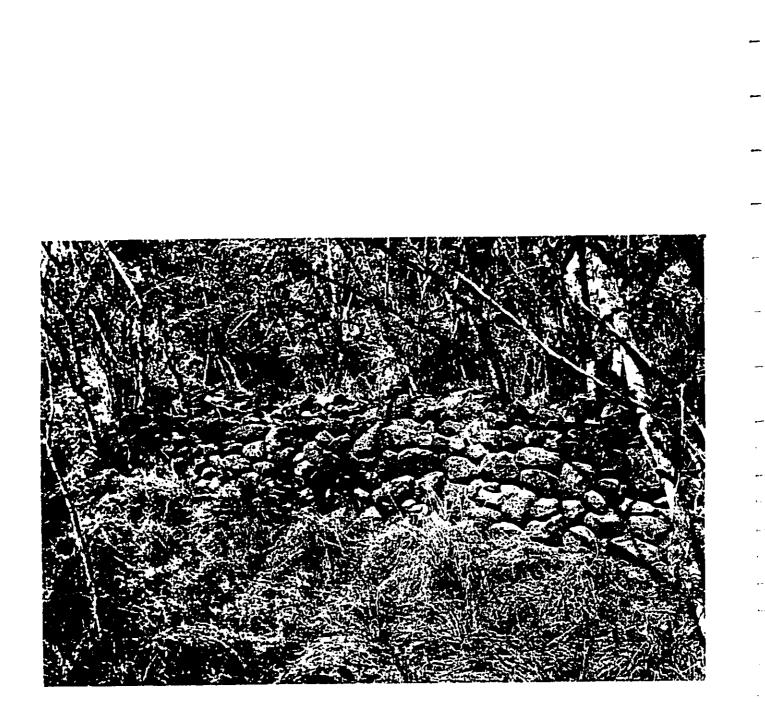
Dry masonry stonework lining irrigation ditch near Reservoir 2.
